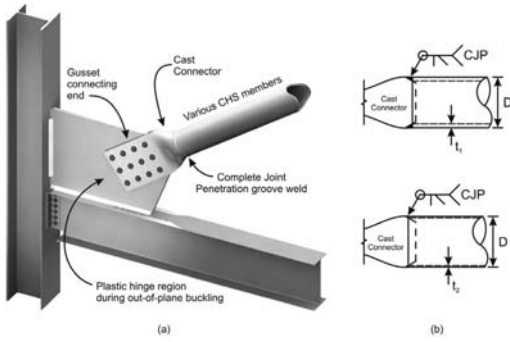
Standardized cast steel brace connector. (a) Brace-connector assembly in frame, (b) Beveled nose detail that accommodates CJP welding to CHS of any wall thickness.
